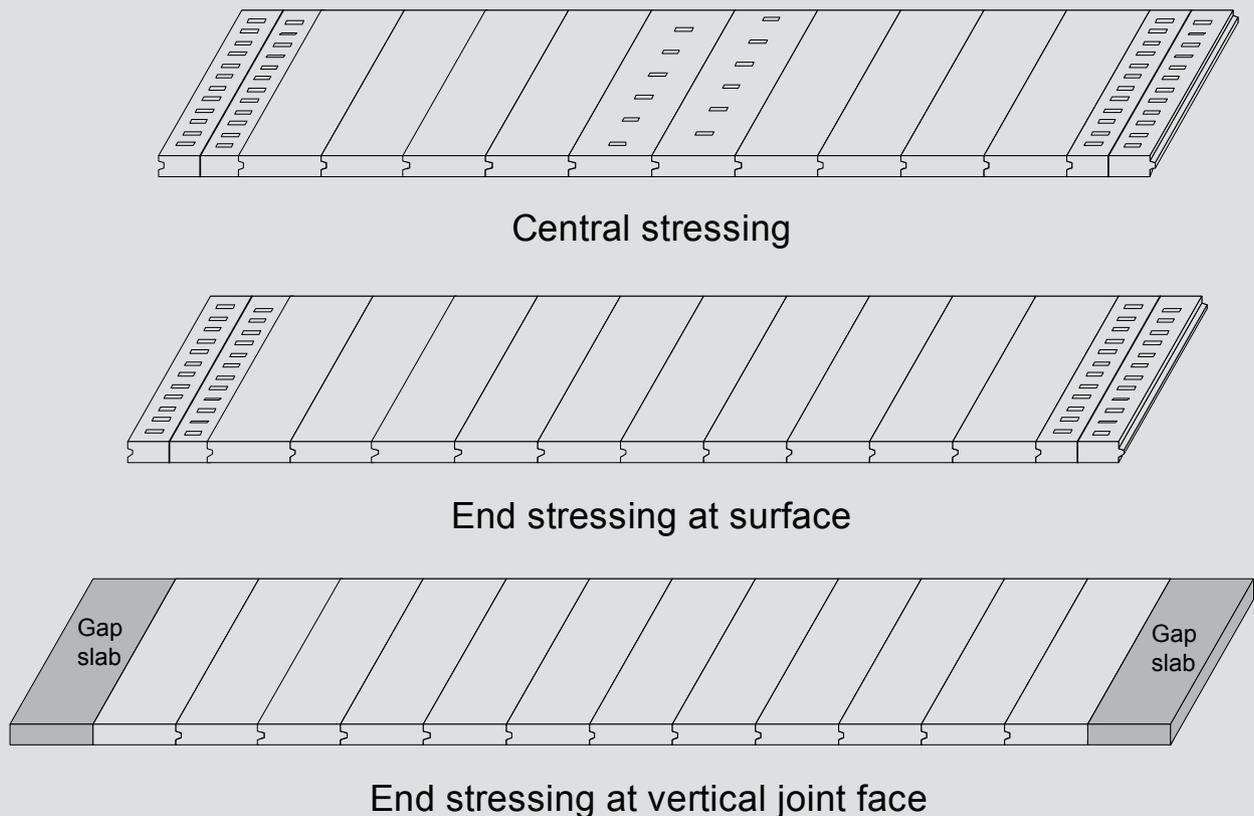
Schematic of three precast, prestressed concrete pavement systems.
